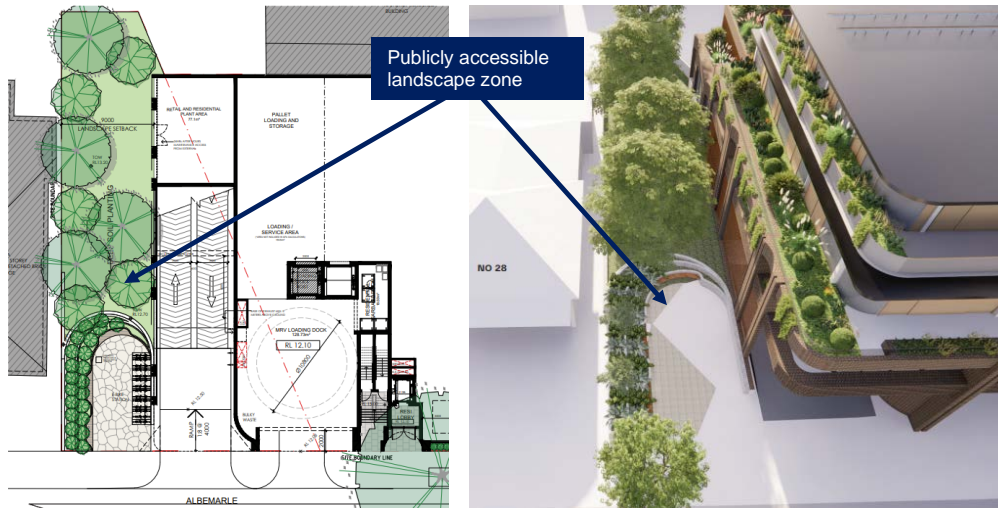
| Concept scheme showing location of publicly accessible landscaped zone (Source: Urban Design Study)
